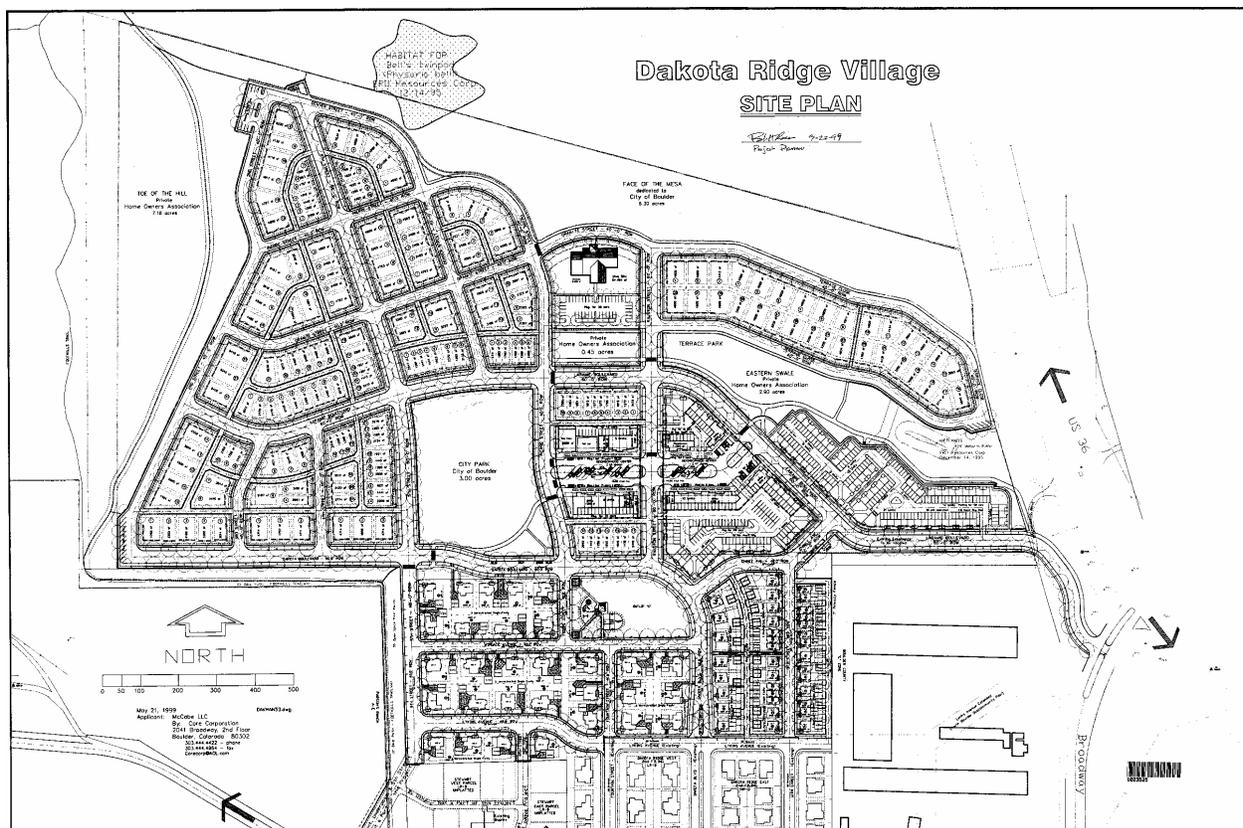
Subdivision Design Providing Road Access for Potential Fire
